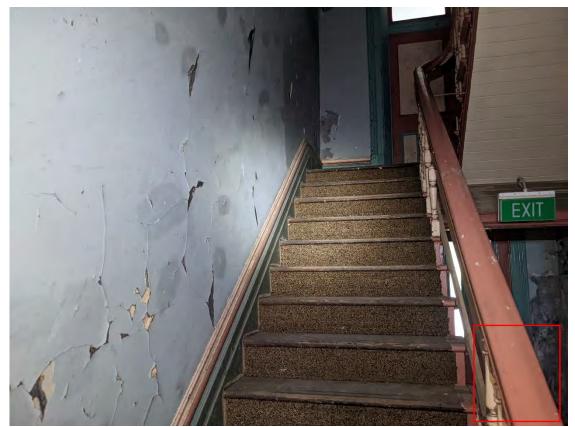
Sample location at STR\_S3. Refer to G17 on Attachment B.
